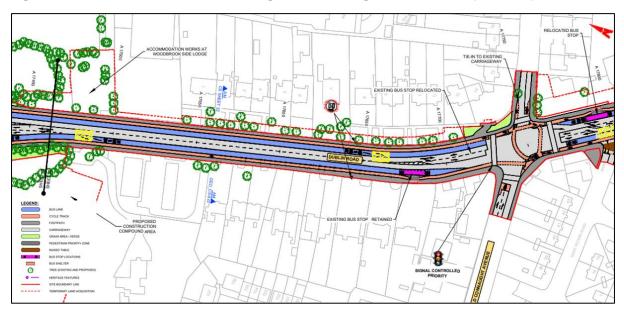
Extract from General Arrangement Drawing at Dublin Road (Sheet 50)
